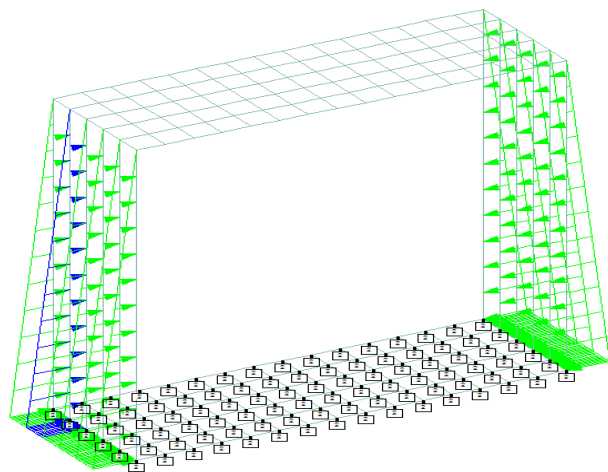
Dry earth pressures on side wall of RCC box culverts
